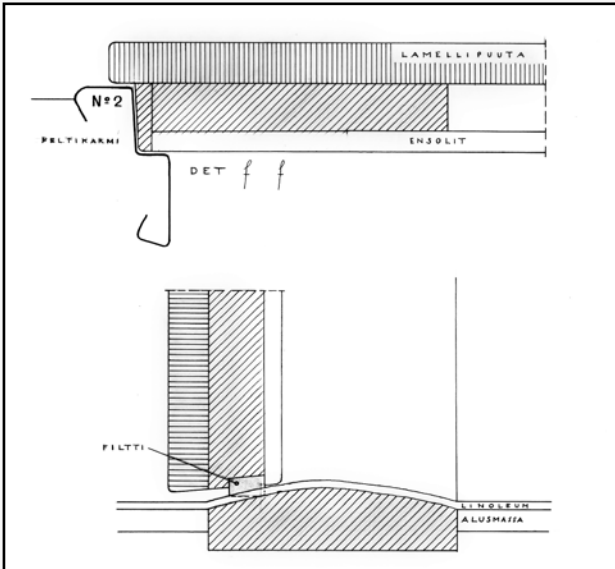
Detail of a standard drawing with sheet metal door frame and undulating threshold. The door panel does not correspond to the reality. Drawing No. 50-162. The drawing has been edited. AAM.
